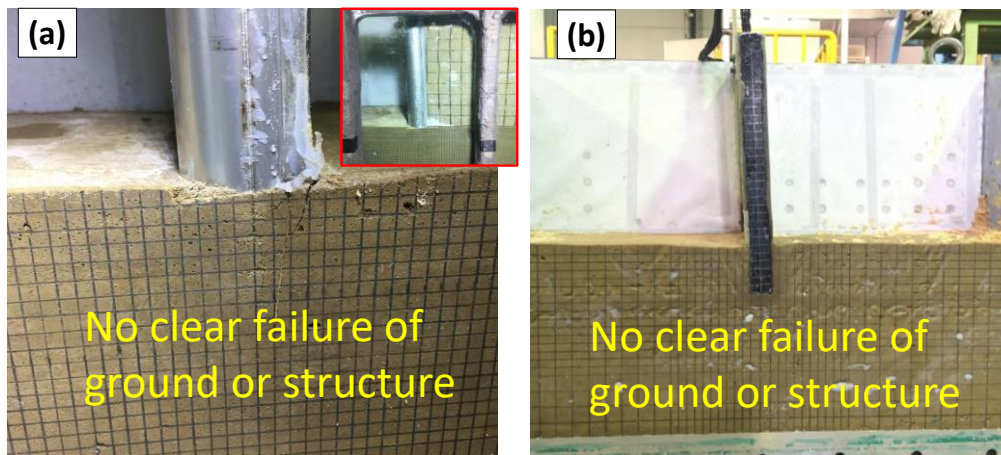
Ground deformations observed after testing for (a) Tubular pile wall and (b) Simplified wall model
